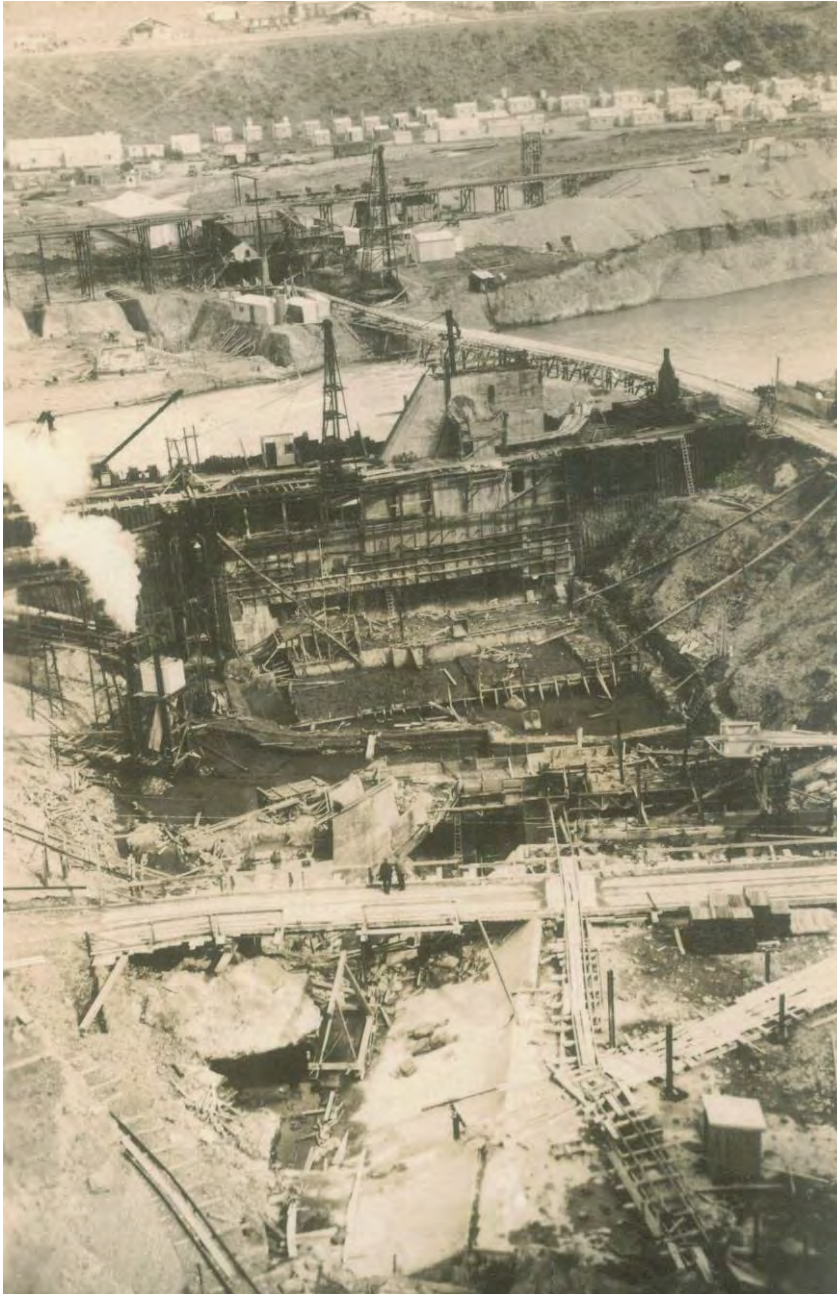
Dewatered Canterbury foundations under proposed diversion sluice blocks
